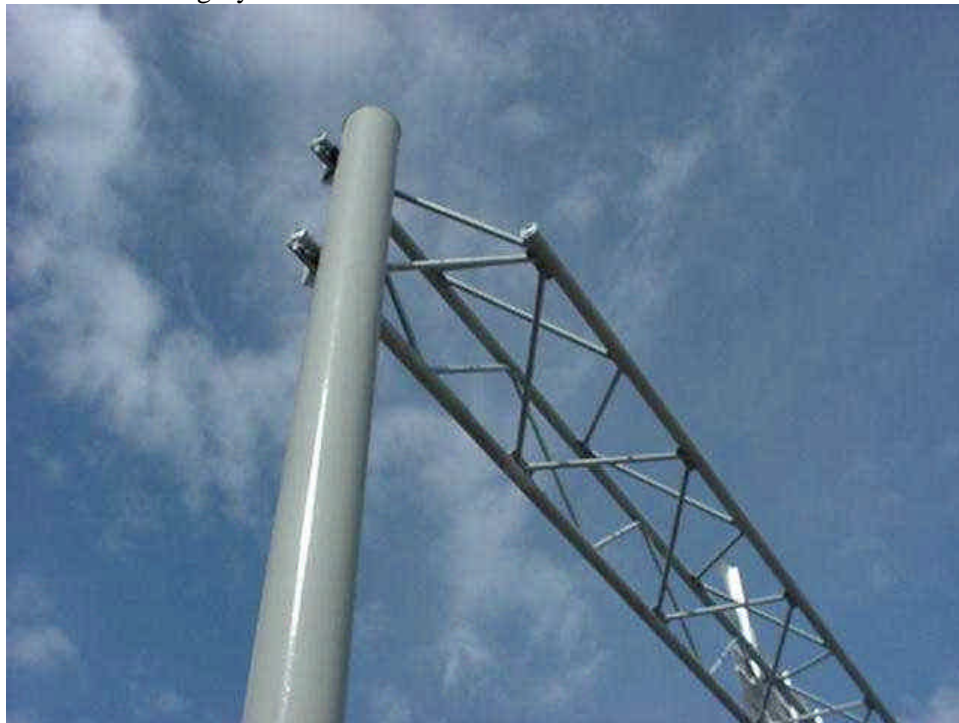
1 Coating – Chord, Trussed Leg of CMS Type Sign Support
